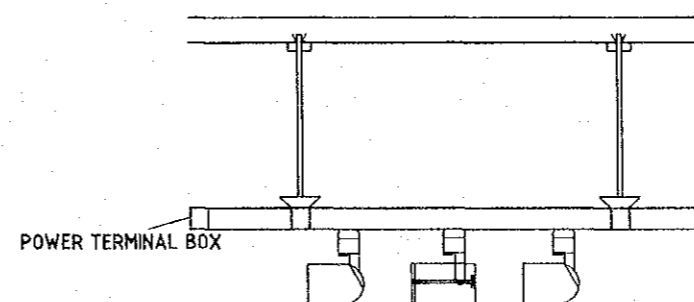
DETAILS FOR SKIRTING TRUNKING CROSSING DOORS AND LIGHT CIRCUIT TERMINATION
